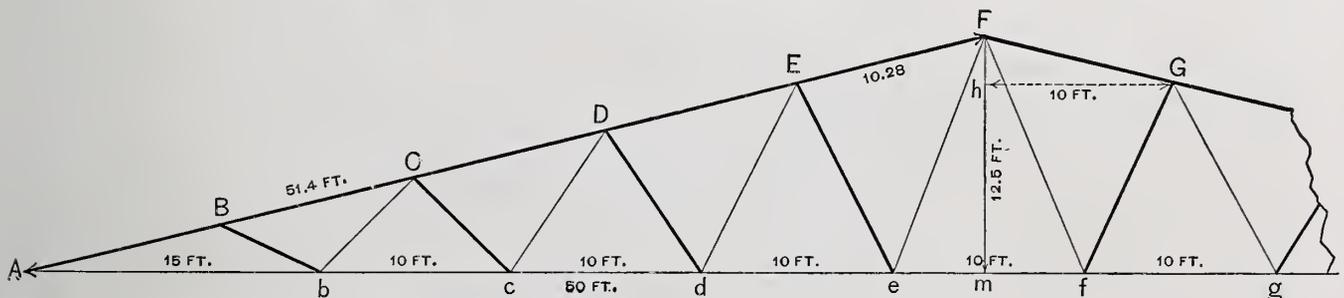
Problem: Find Strains in Roof Truss A F G, g under Steady Load and Wind Action from the Left. Length of Span 100 Feet. Length of Rafters 51.4 Feet. Height of Roof F m = 12.5 Feet. Horizontal Panel Length h G = 10 Feet. Rafters to be 20 Feet Apart from Center to Center. Total Steady Load 50 Tons, or One-half Ton per Foot of Span.
